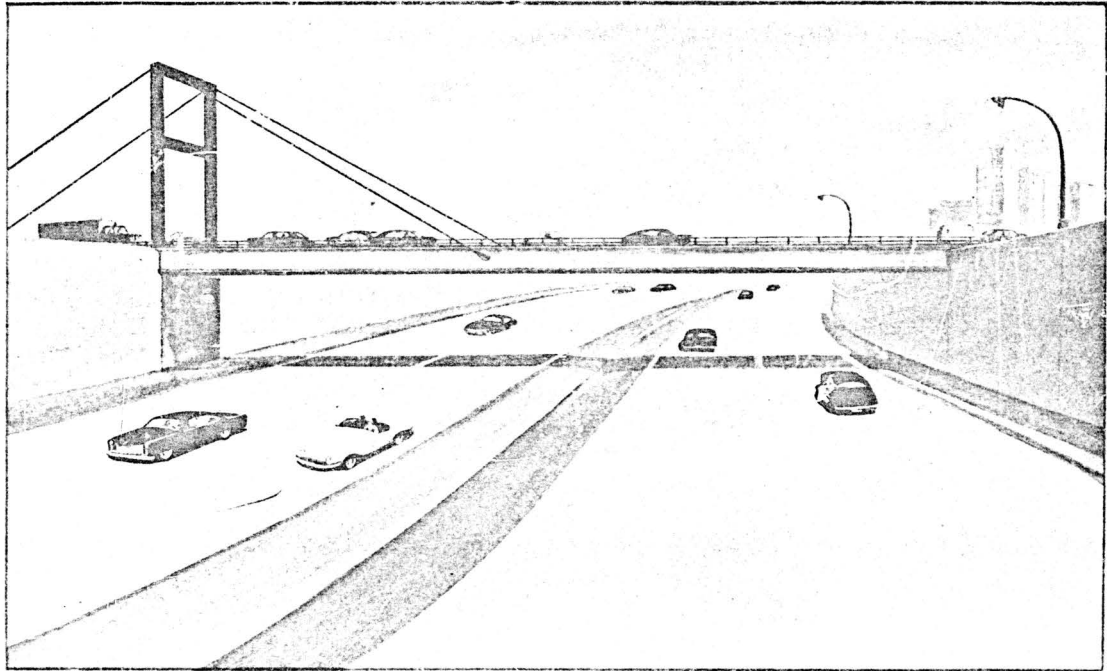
ARTIST'S SKETCH OF BRIDLE BRIDGE
